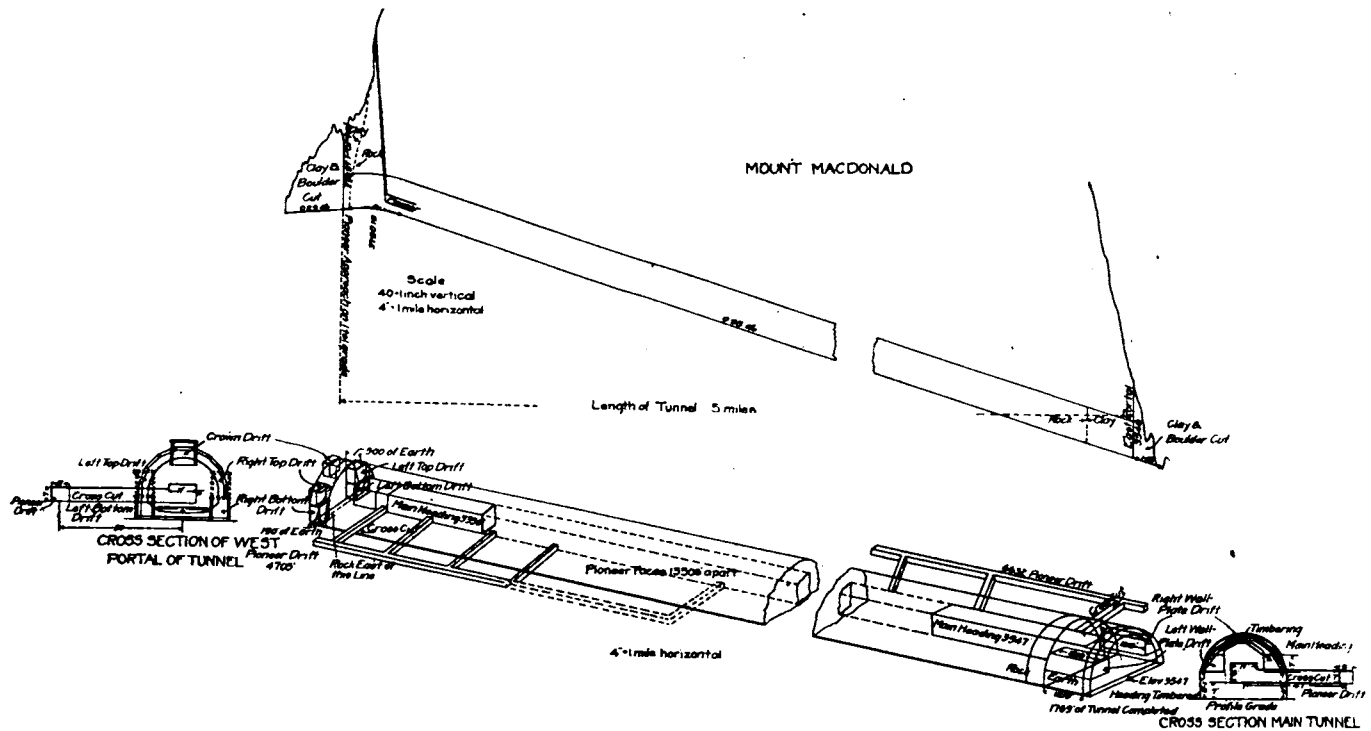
Construction Plan of Rogers Pass Tunnel, Canadian Pacific Ry.
